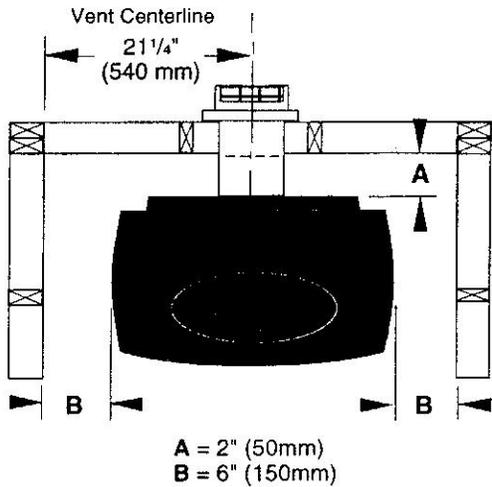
Freestanding Parallel installation; minimum clearances.
